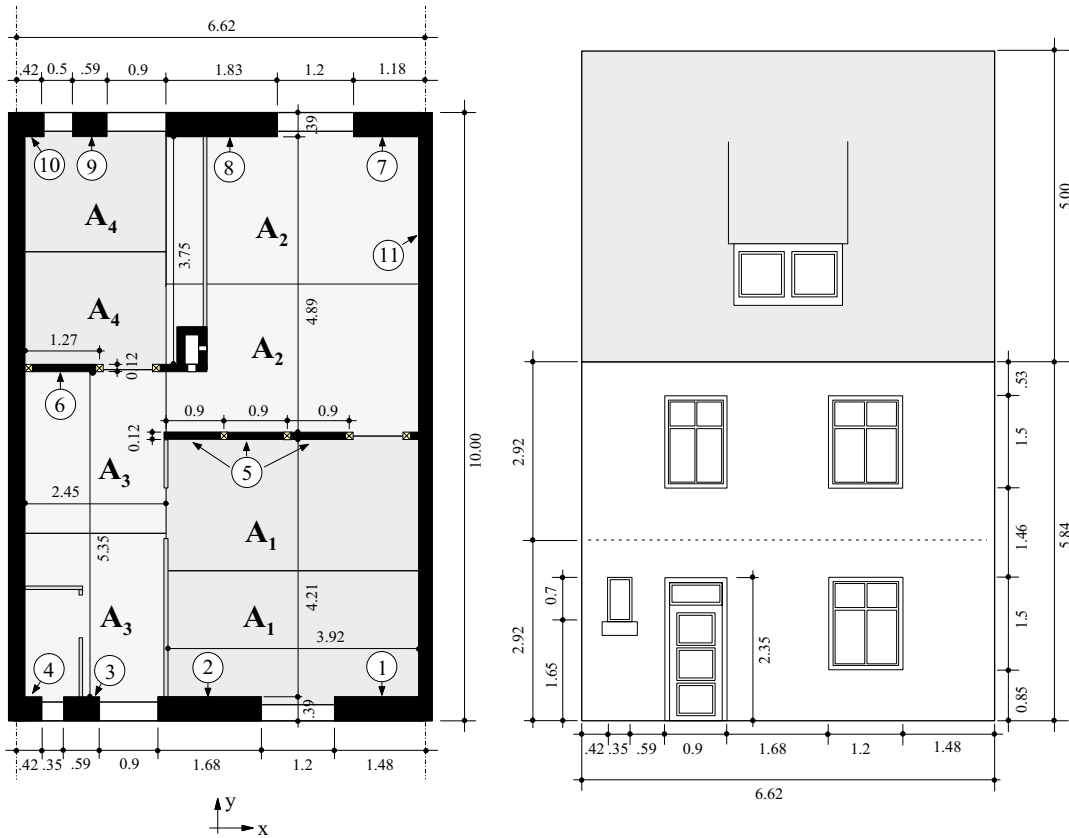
Plan and elevation of the 2-storey example building, all dimensions in m
